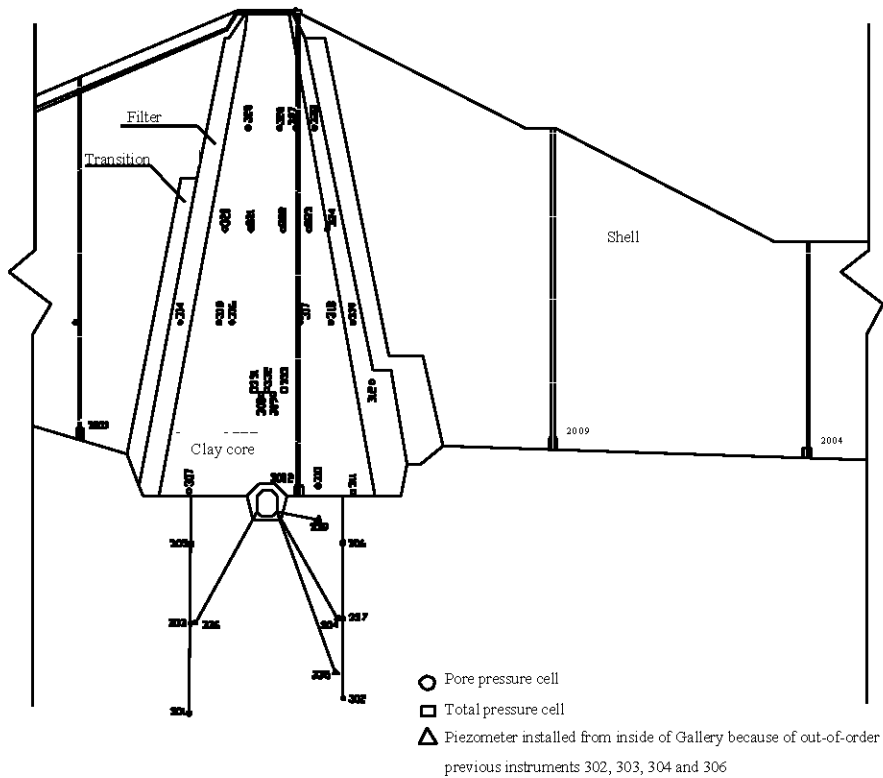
Third instrument installation section (only the centric segment of section is presented)
